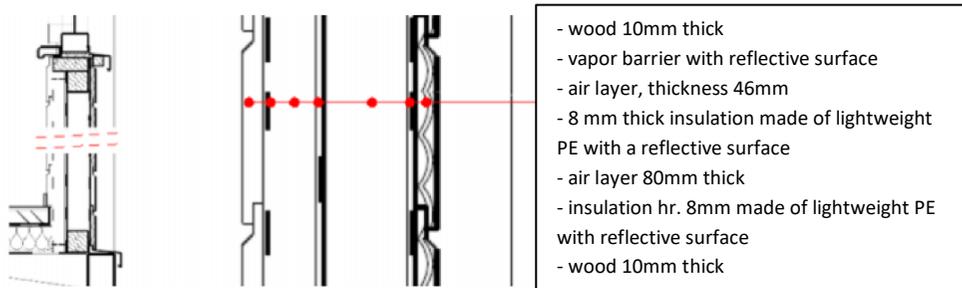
Section of the wall structure with applied reflective insulation (Kalánek, 2016)
